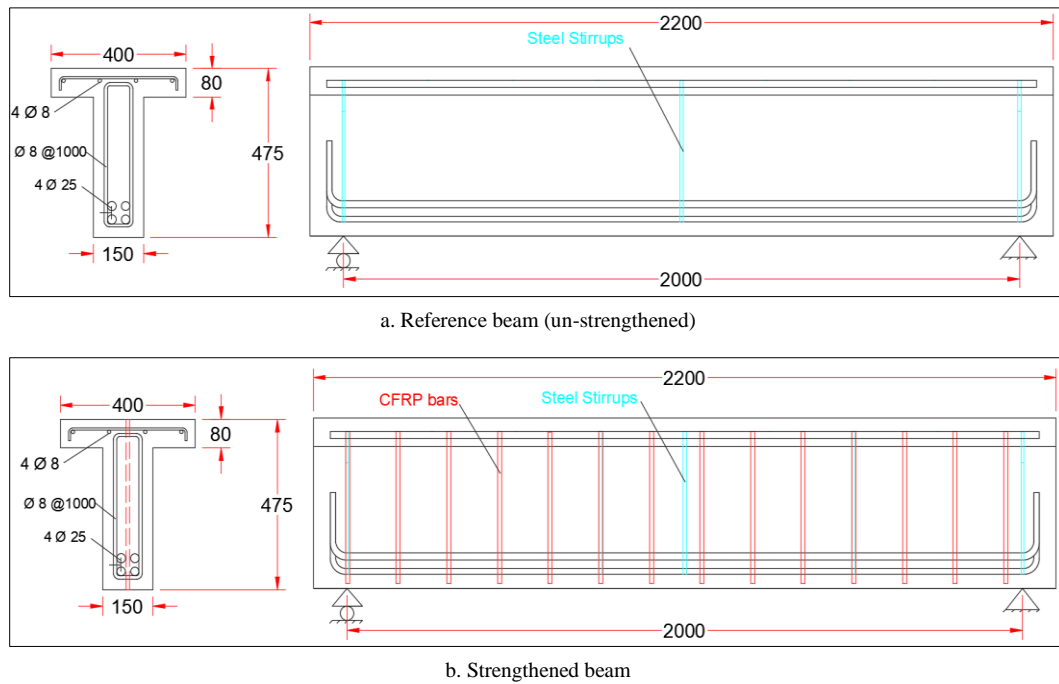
Details of the beams for group two without stirrups (just three for support) (all dimensions are in mm)
